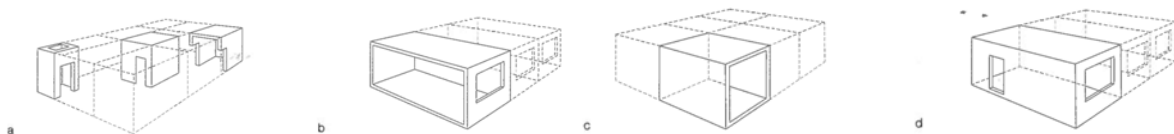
Different room module construction systems: combined with large panels (a), with long sides open and load-bearing external walls (b), with one open transverse end (c), all sides closed (d).⁹⁹
